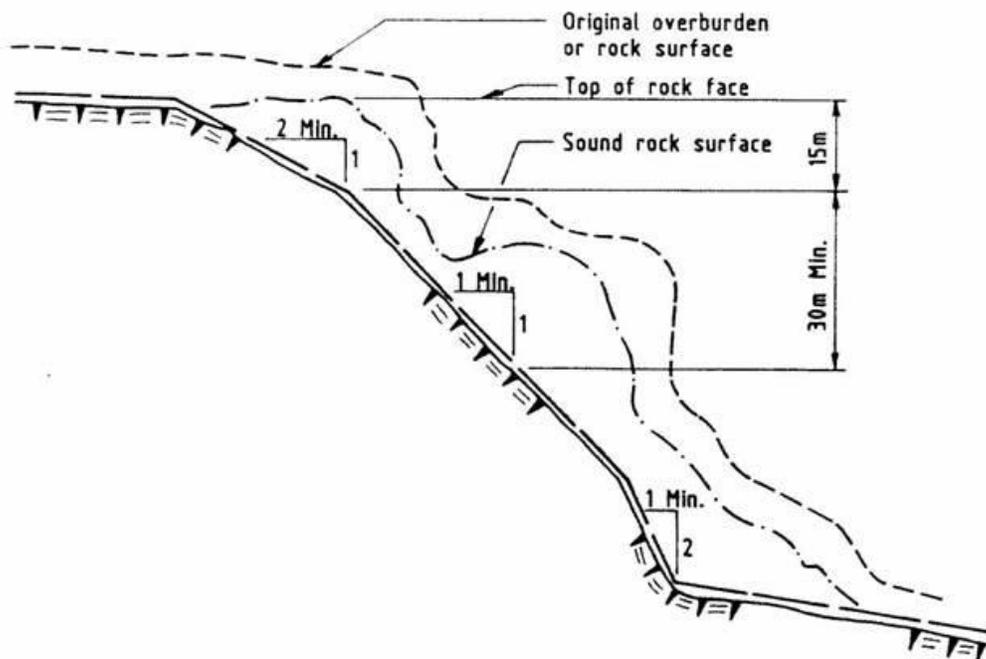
Bennet Dam, typical core abutment excavation requirements
